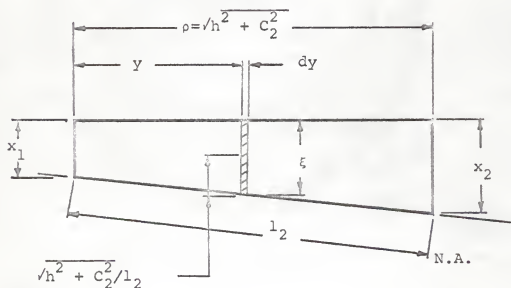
COMPRESSION ZONE AT FAILURE OF A RECTANGULAR REINFORCED BEAM
